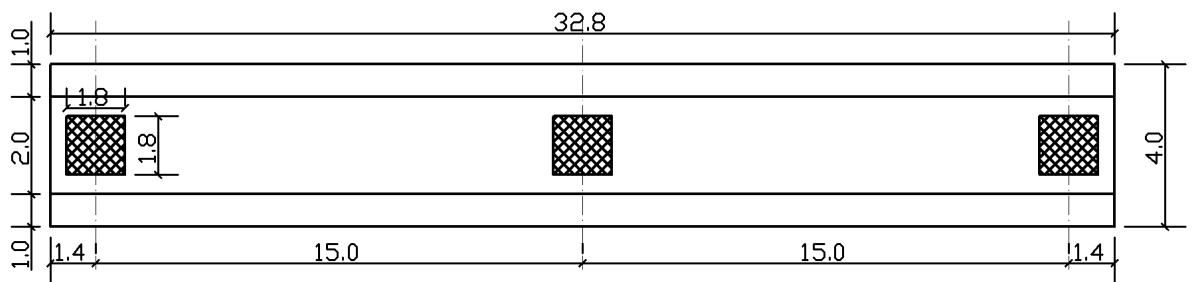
Alharamain Bridge Pier #5 and Pier #6 footing details
